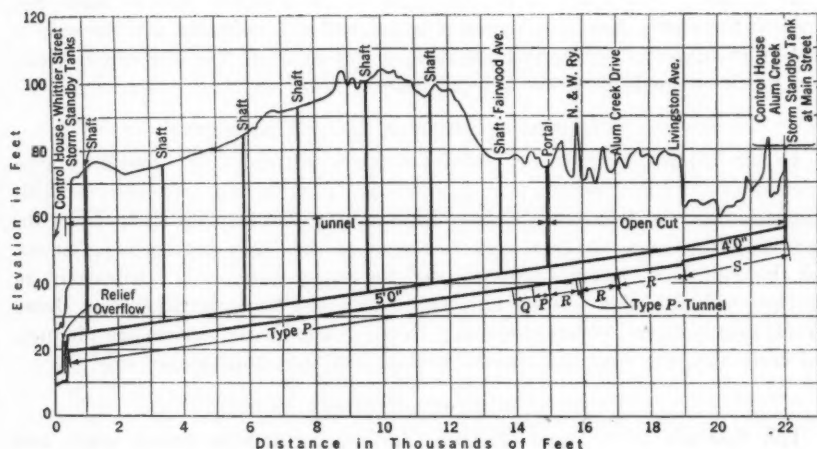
PROFILE OF ALUM CREEK INTERCEPTING SEWER, COLUMBUS, OHIO.
